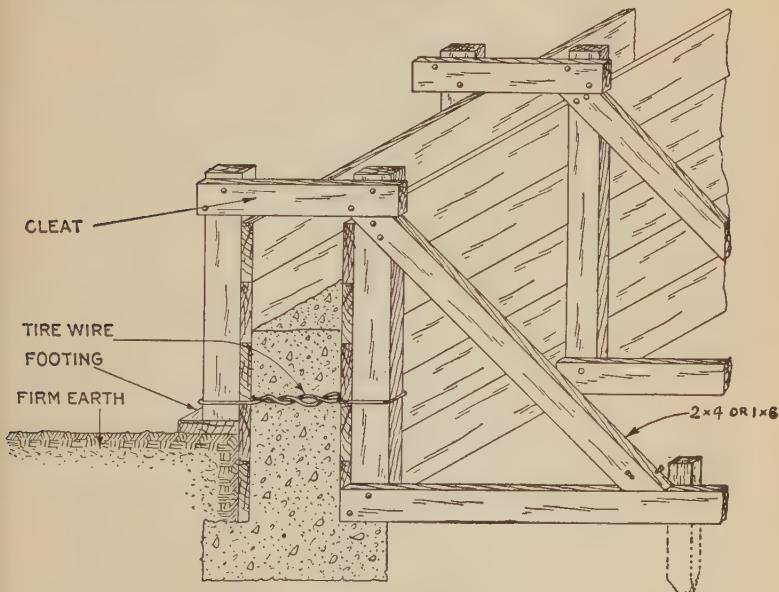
,966.—Single side foundation form, for foundation built in firm earth.
